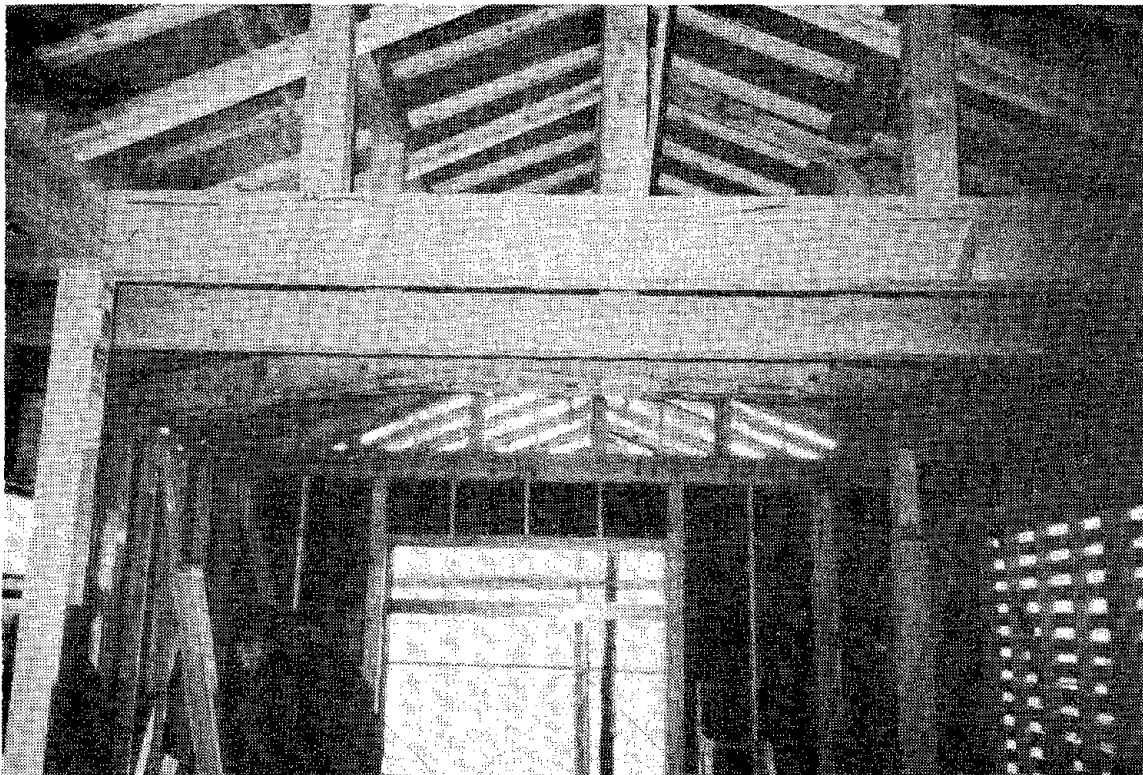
Wooden house under construction. Could metal fasteners and plywood sheathing be added to this structure without sacrificing its aesthetics?
